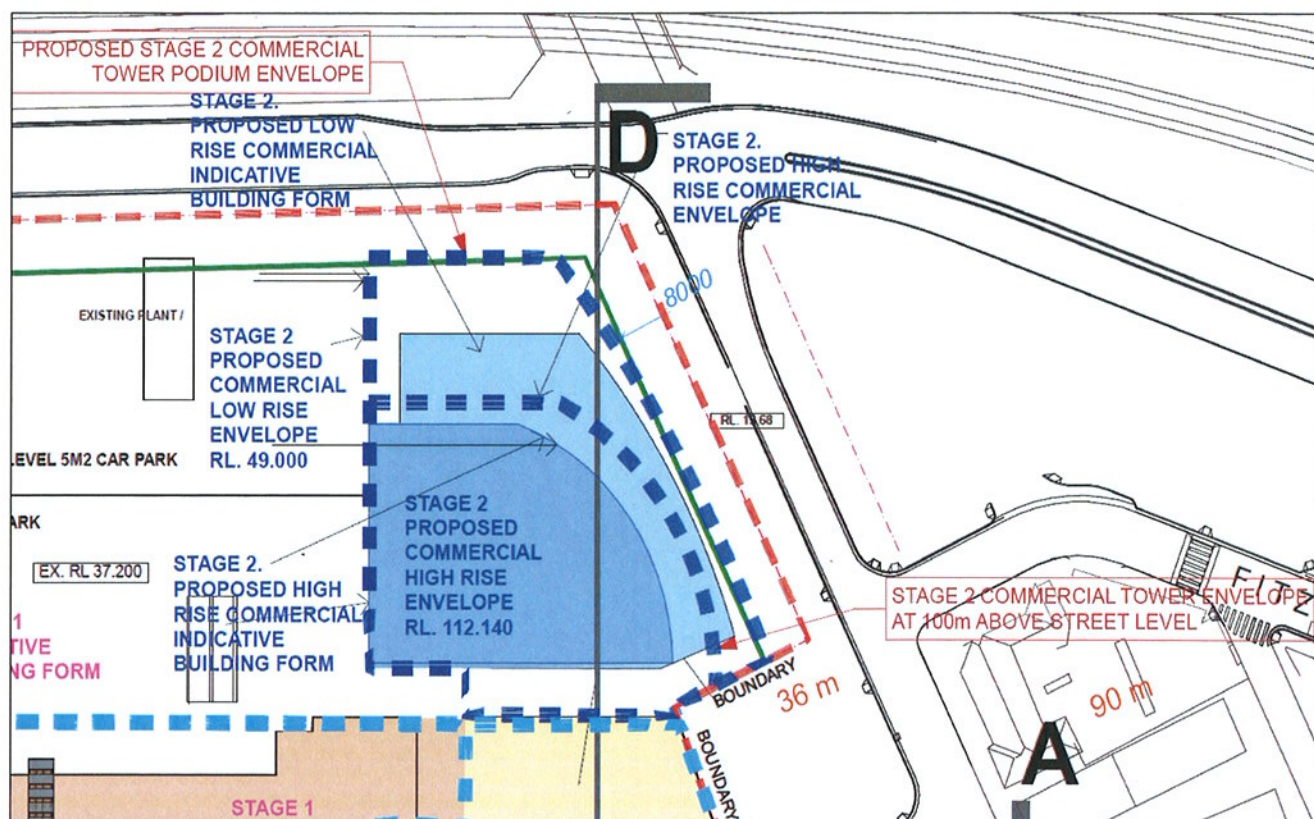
Tower building envelope (Source: Proponent's Environmental Assessment)
